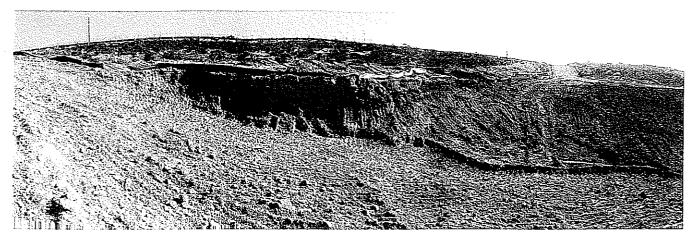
Site 11: Overexeavation of Canyon Ploor (November 5,1999)
